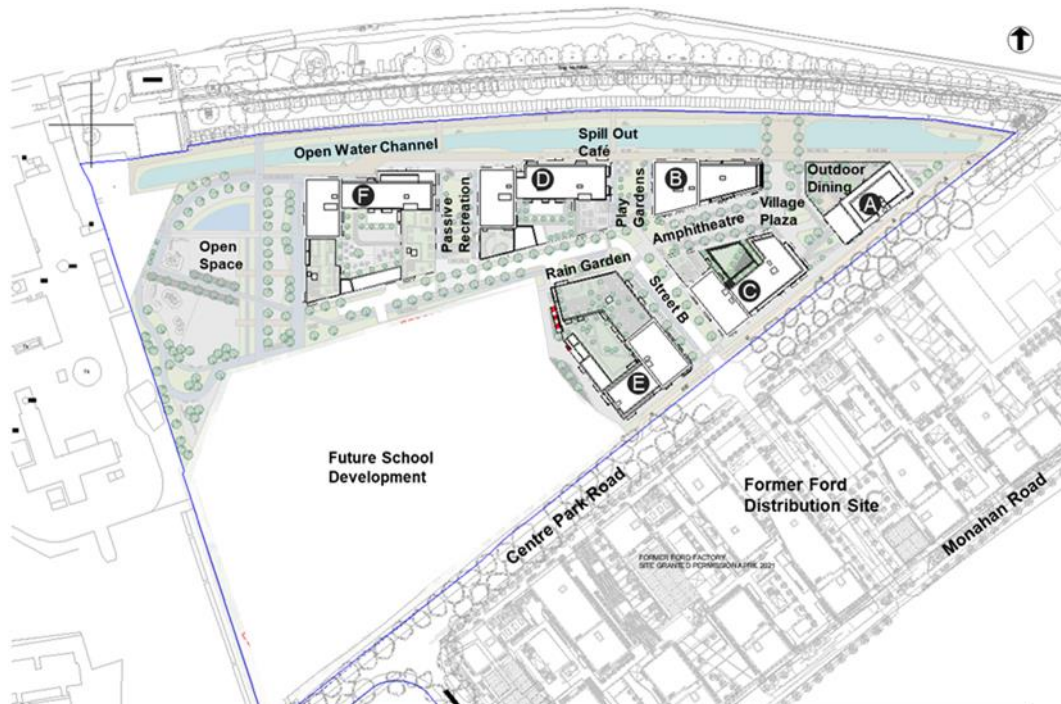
Proposed layout of the City Park development at former Tedcastles site
